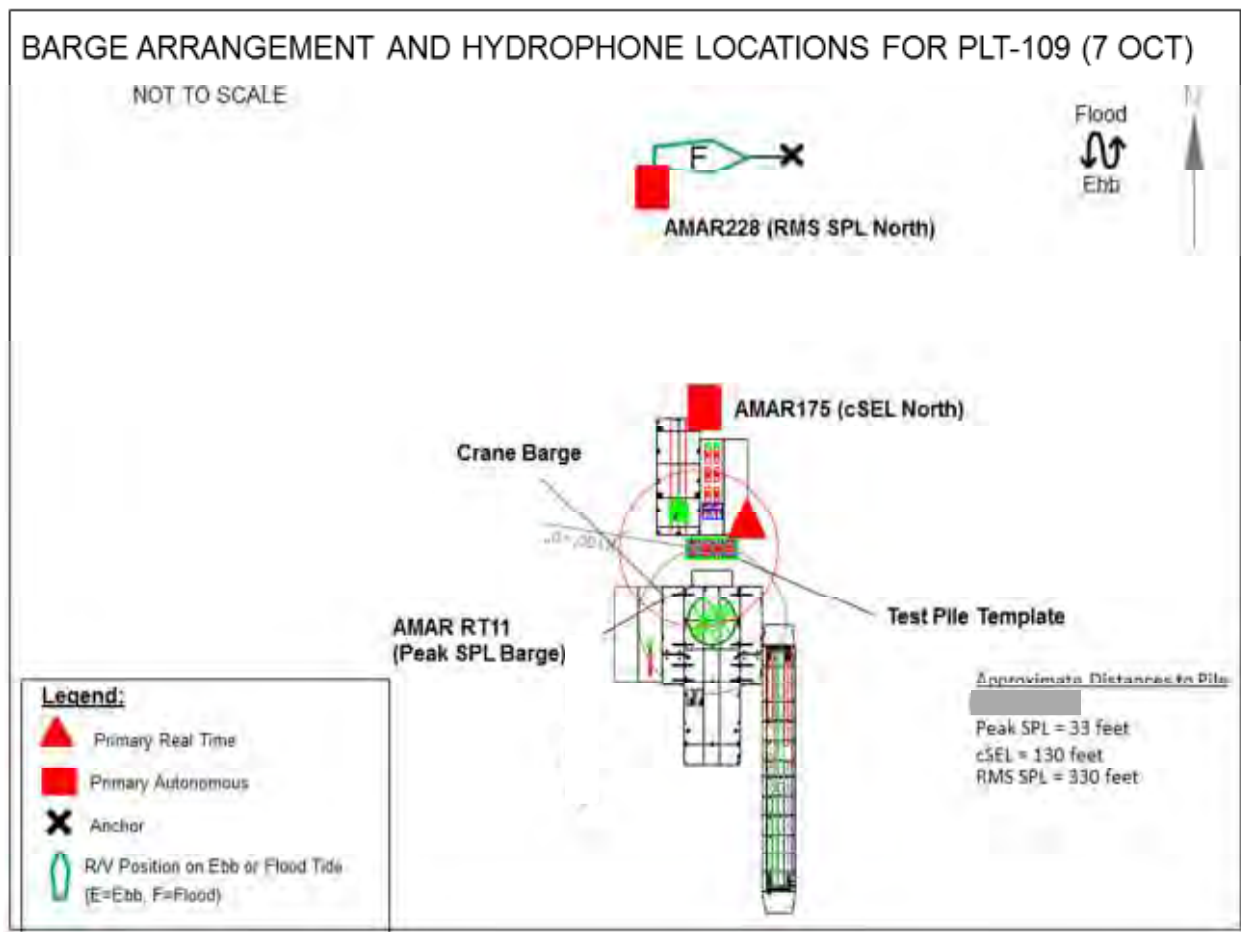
Plan view of pile and barge layout, 07 October 2013, Test Pile PLT-109.
